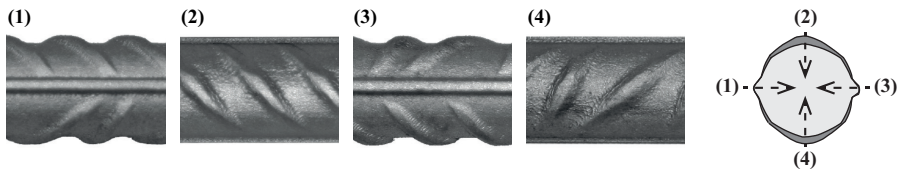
Details of the reinforcement ($d_b = 10$ mm) used for the headed bars (SB3, SB9)
